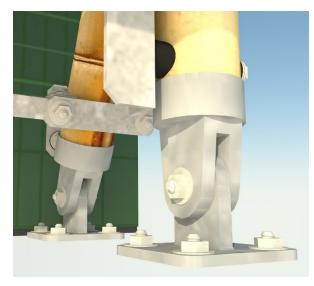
Detail of Main Bamboo Frame to Adjustable GMS Fixing Point to Paving.
